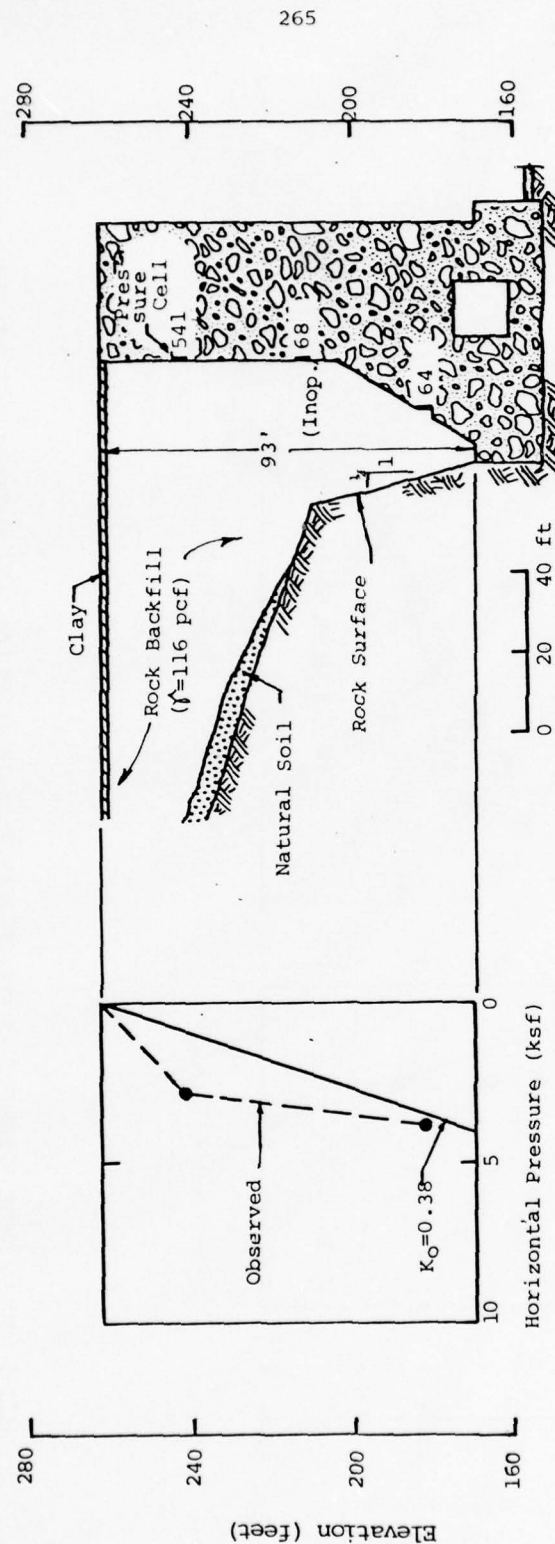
TOTAL EARTH PRESSURE AT END OF CONSTRUCTION, MONOLITH 10L, BANKHEAD LOCK AND DAM
